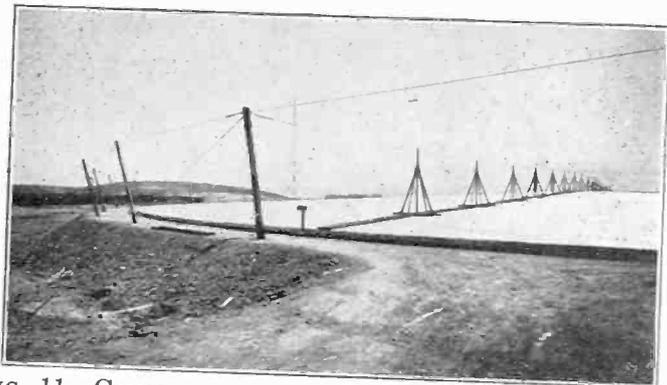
CONSTRUCTION ON THE EMBANKMENT OF A LARGE RESERVOIR SHOWING THE PERIPHERAL CABLE, GRID AND, IN THE BACKGROUND, A STEEL TOWER
